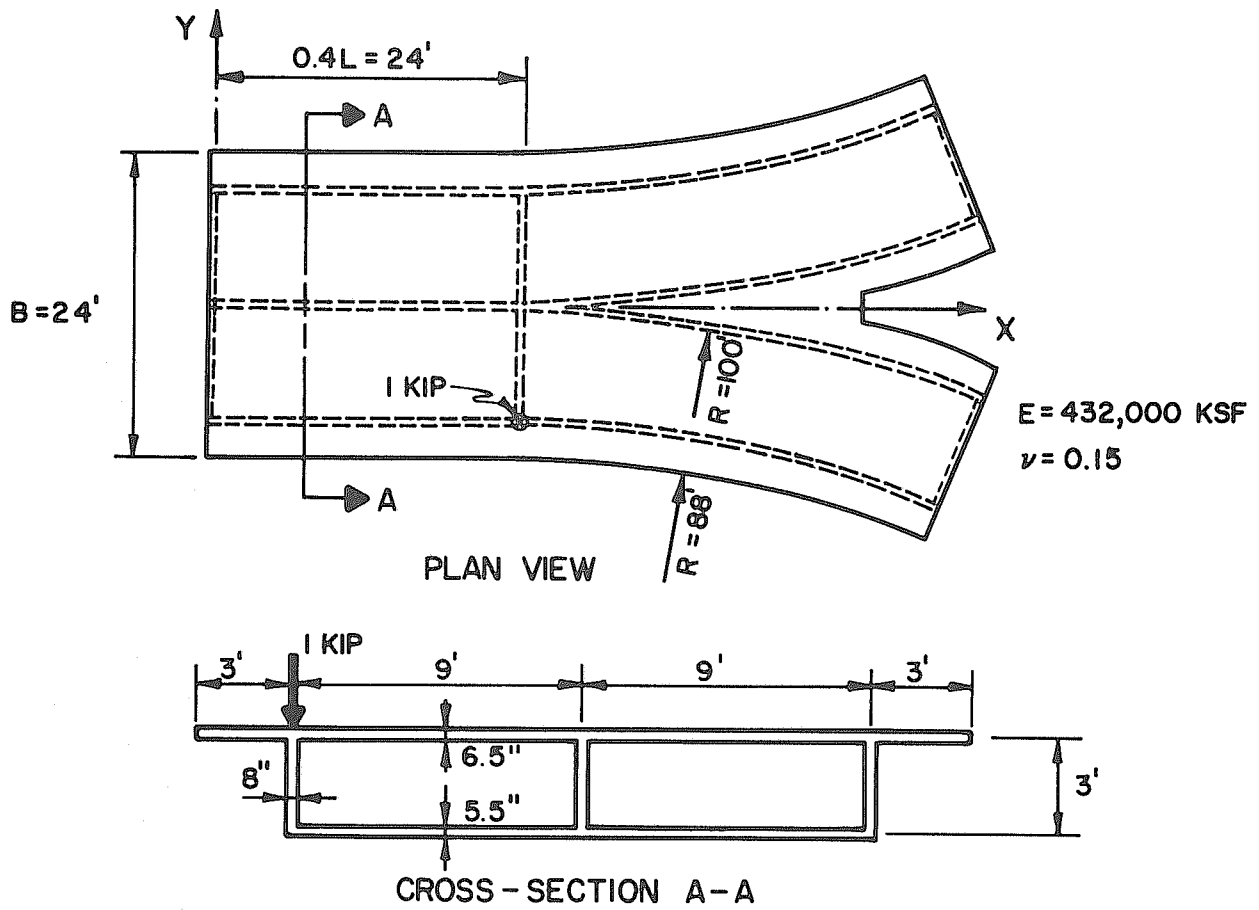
EXAMPLE 6 - TWO CELL HIGHWAY BOX GIRDER BRANCH
